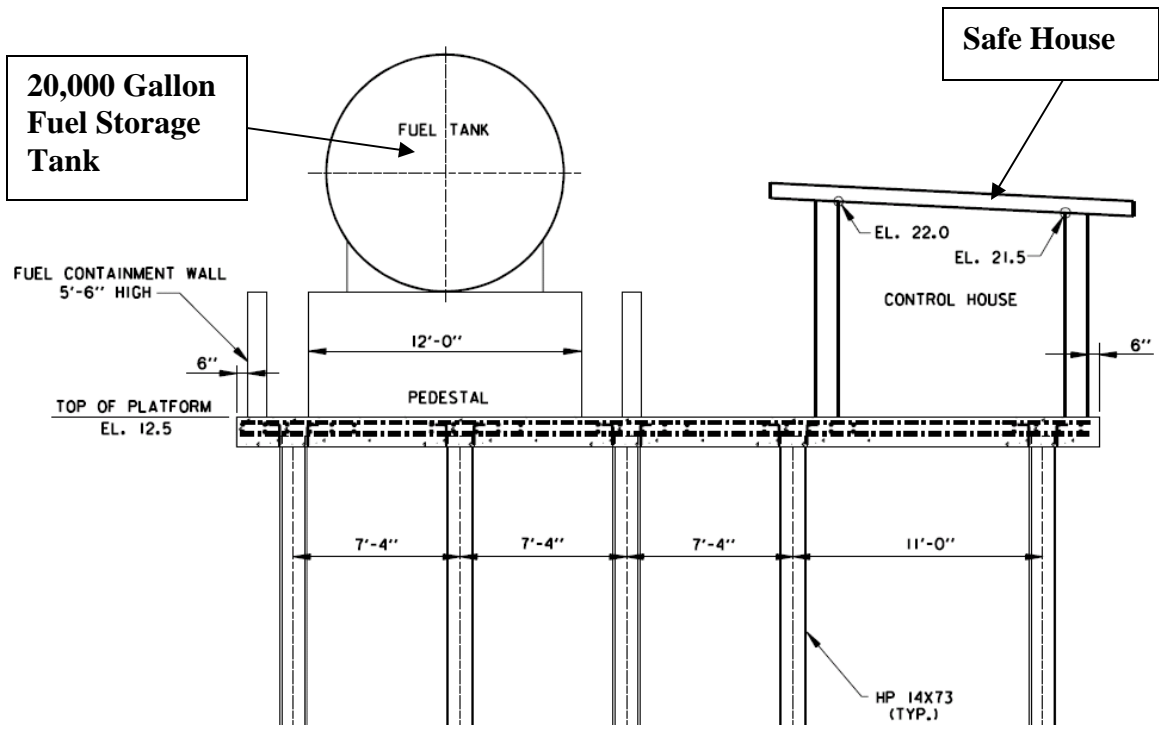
London Avenue Phase 1 Fuel Tank and Safe House Typical Section
